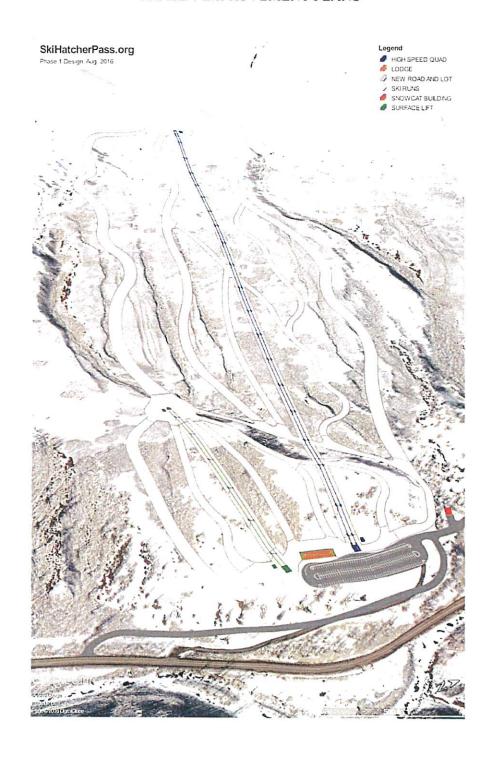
EXHIBIT B – WORK PLAN AND PHASE I IMPROVEMENT PLANS
